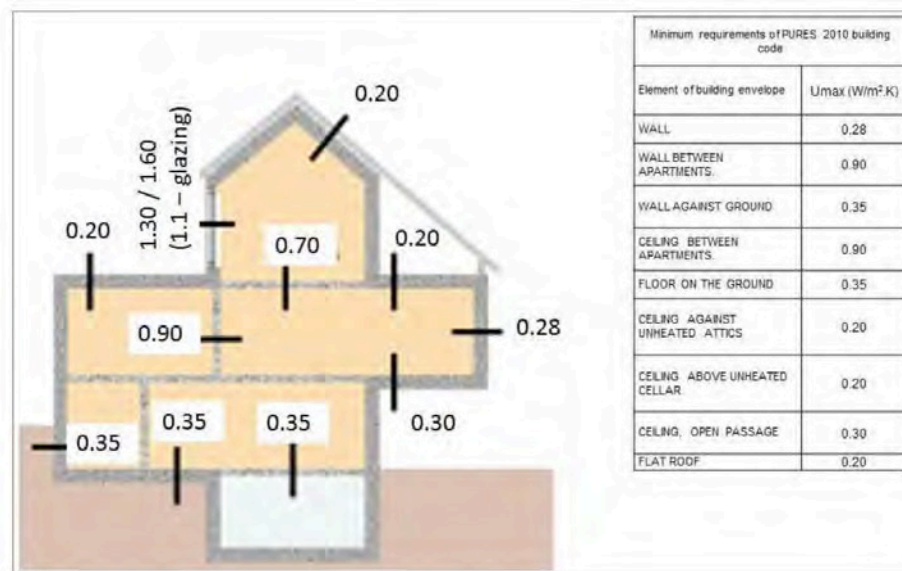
Minimum requirements of the PURES 2010 Regulation for the building envelope elements in case of new buildings and renovation of existing buildings, U_{\max} (W/m²K).⁵⁸
